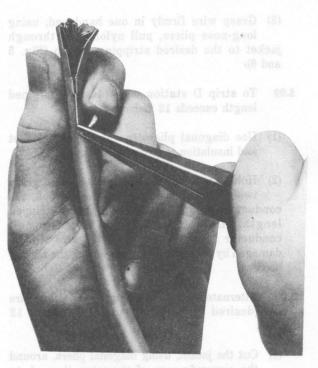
Stripping D Inside Wiring Cable or G Station Wire (With Jacket-Slitting Cord)
